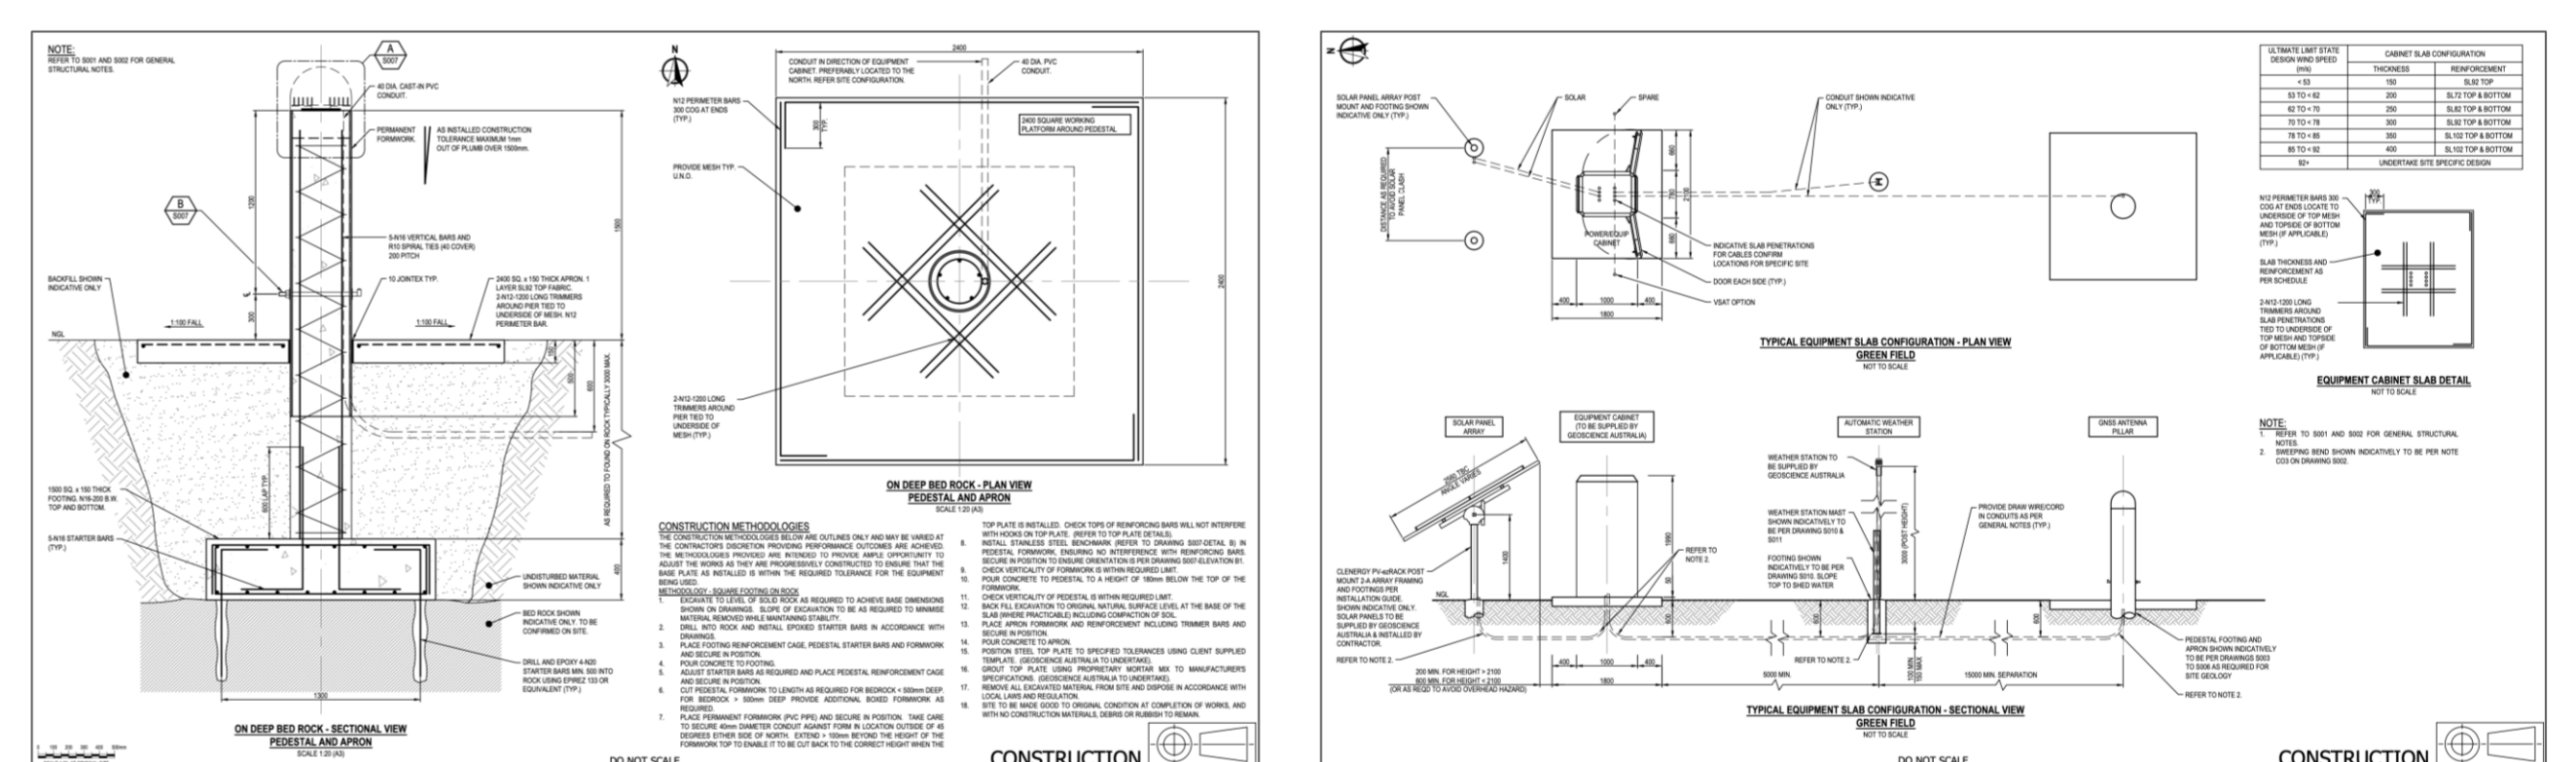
Our certified design plans for the concrete monuments can be shared with the community.
